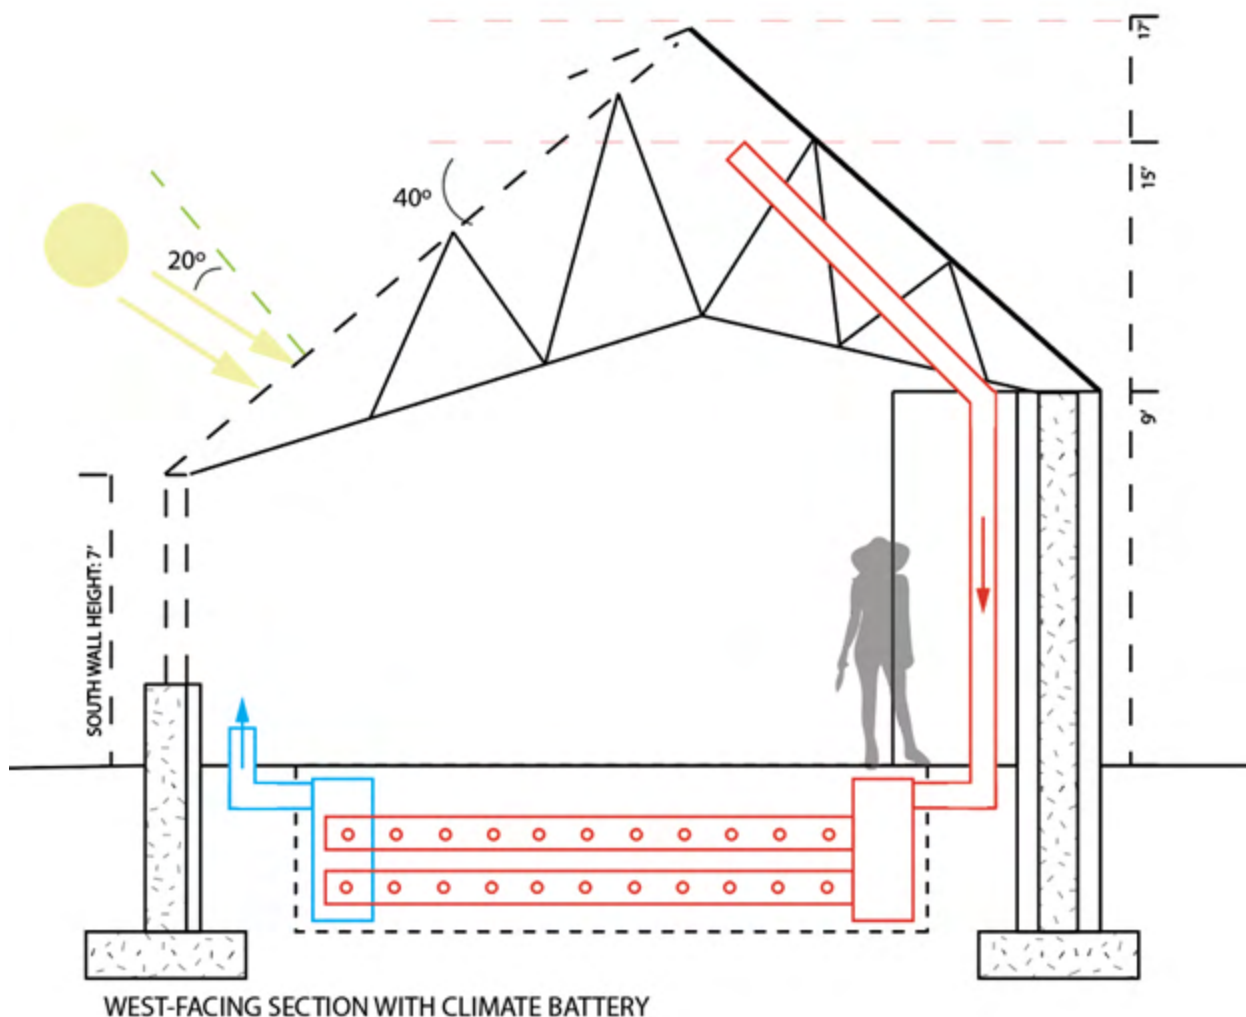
West-facing section drawing illustrating roof angles, wall heights, and climate battery depth.
